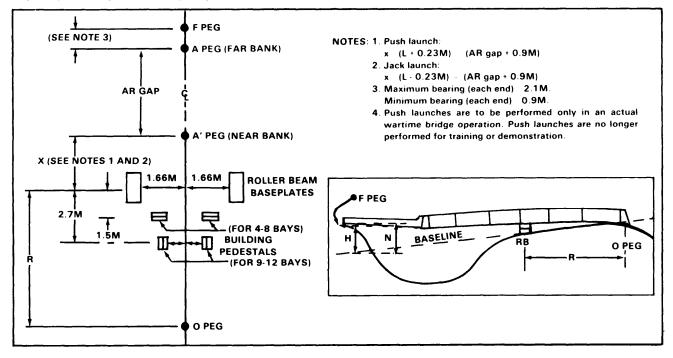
Single story MGB site layout (4 through 12 bays)
